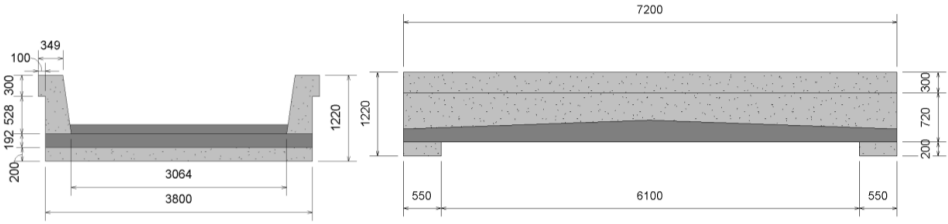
Trough bridge drawings: frontal elevation (left) and lateral elevation (right).
